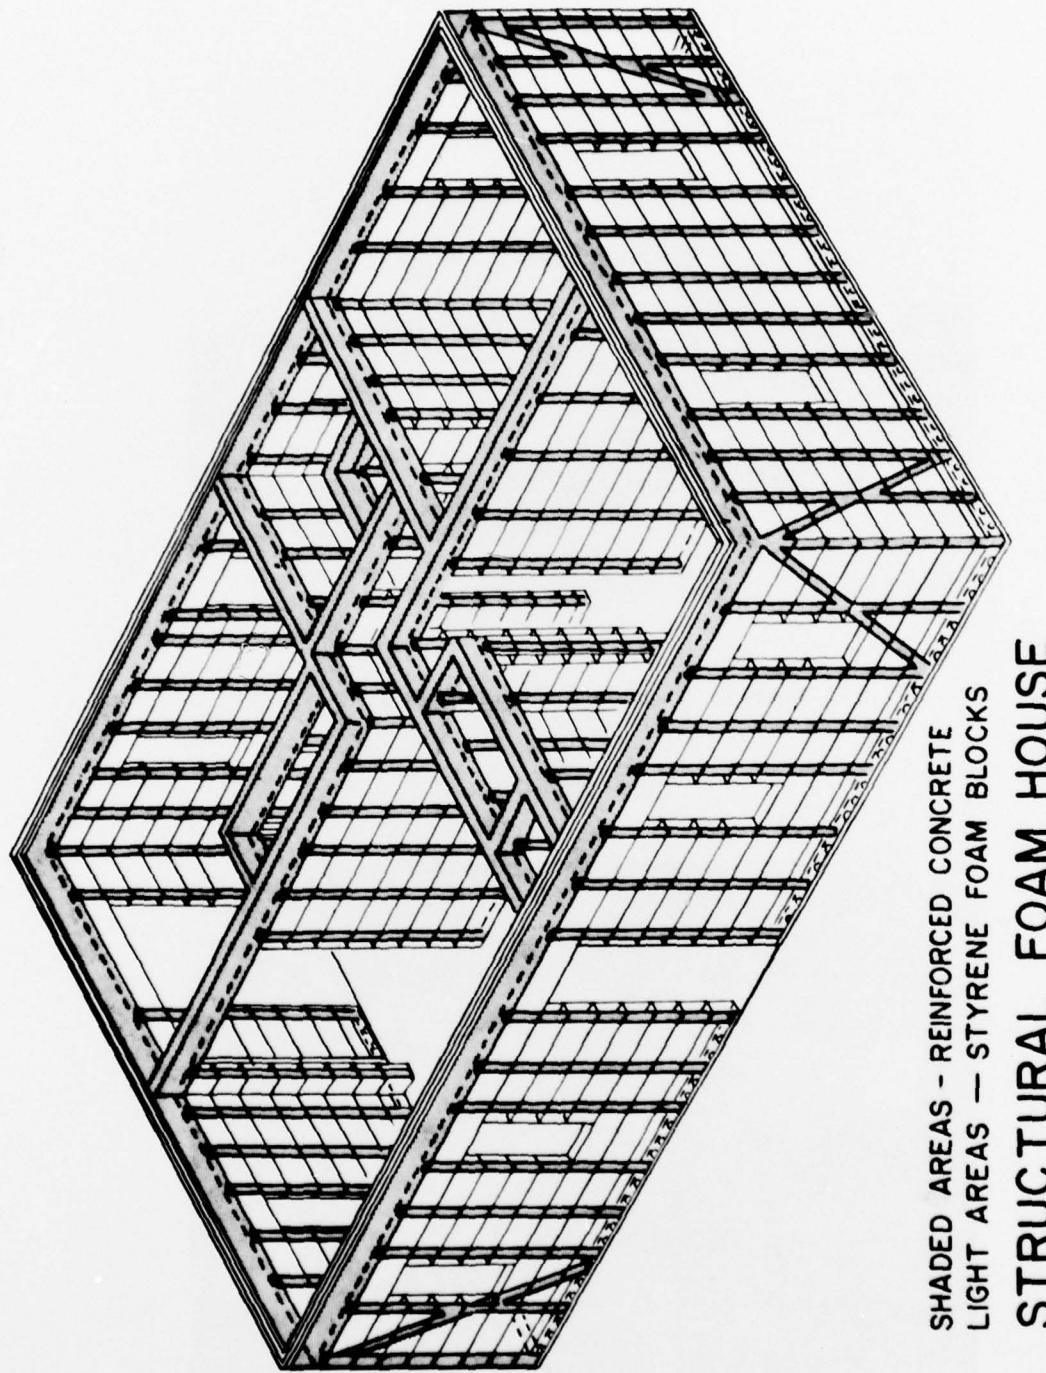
Arrangement of reinforced concrete and styrene foam blocks.
